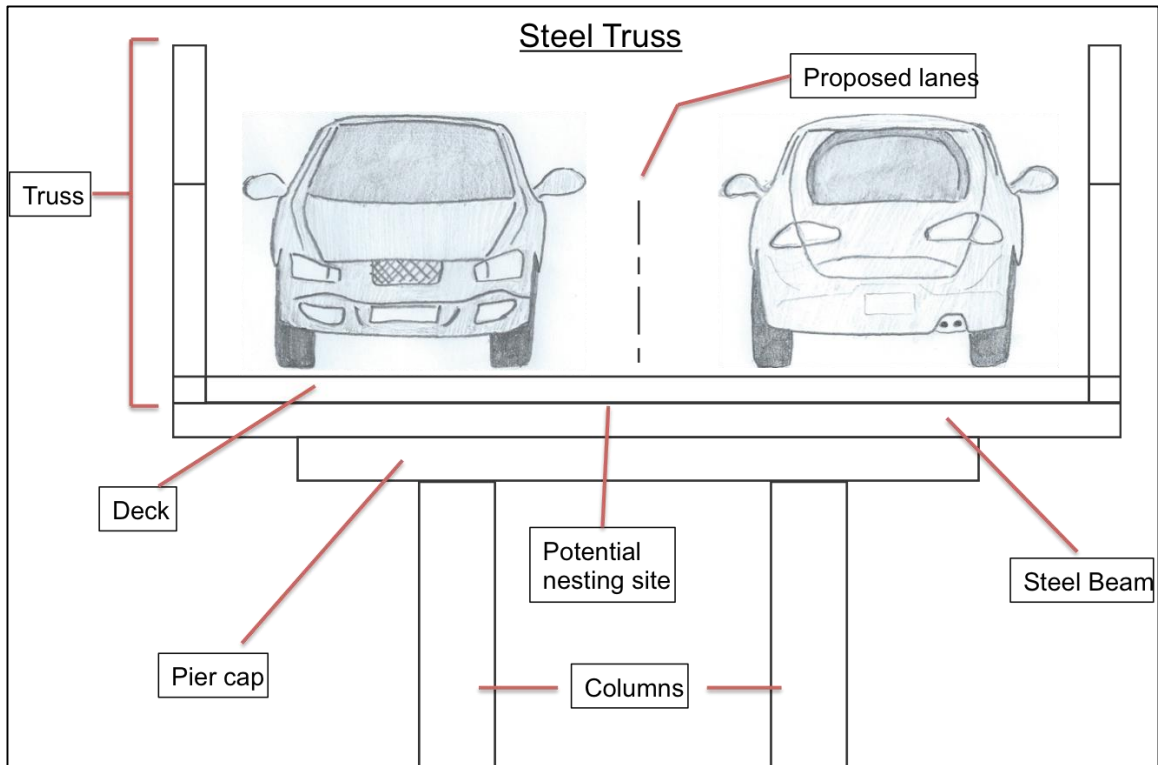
Cross-section of a warren truss bridge with potential nesting site
